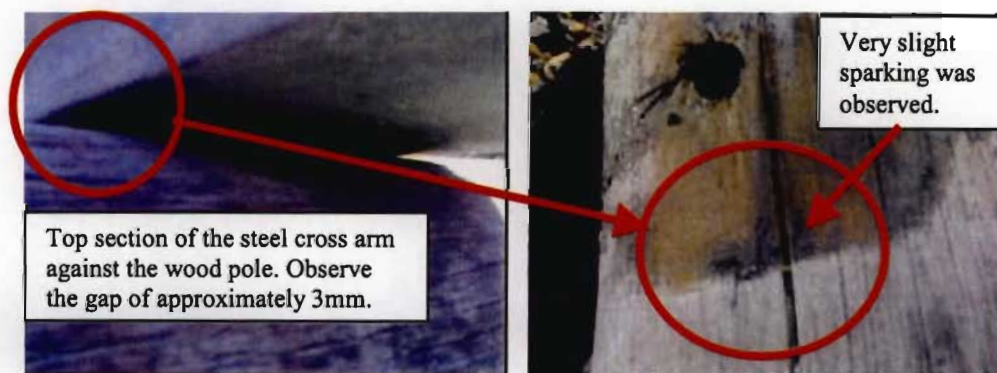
8: Illustration of tracking / sparking from steel cross arm to wood surface.
